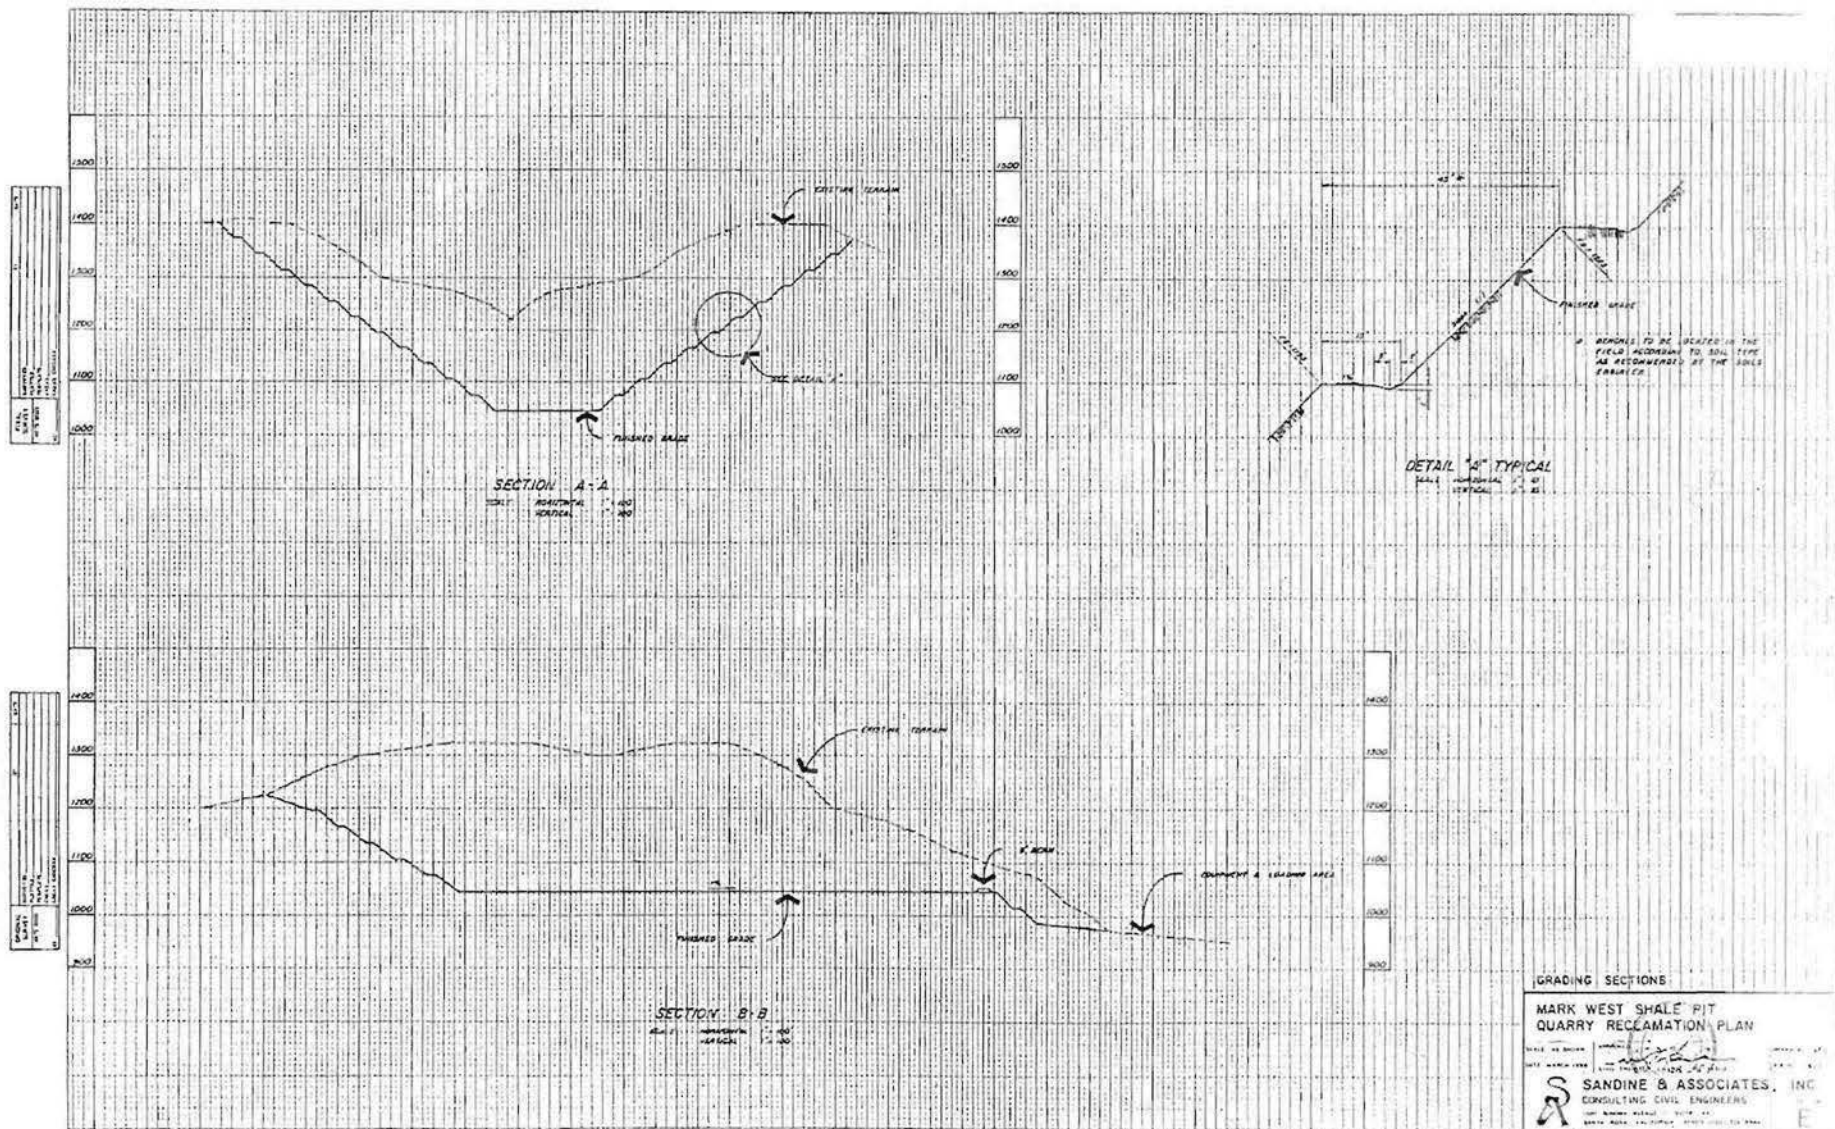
1988 RECLAMATION PLAN - GRADING SECTIONS
